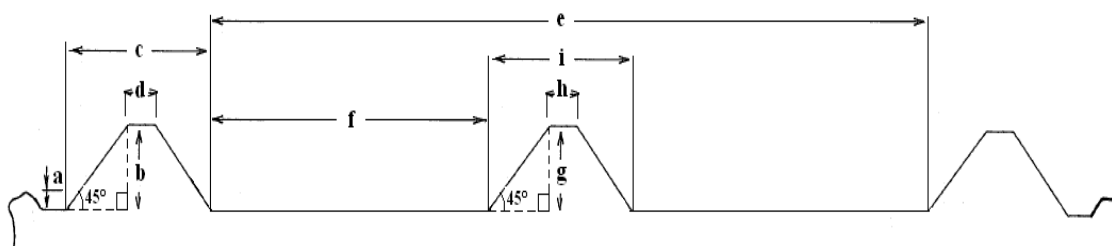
Cross section diagram of a completed raceway. a. plow lip height, b. perimeter berm height, c. perimeter berm bottom width, d. perimeter berm top width, e. total raceway width, f. raceway channel width, g. center berm height, h. center berm top width, i. center berm width.
